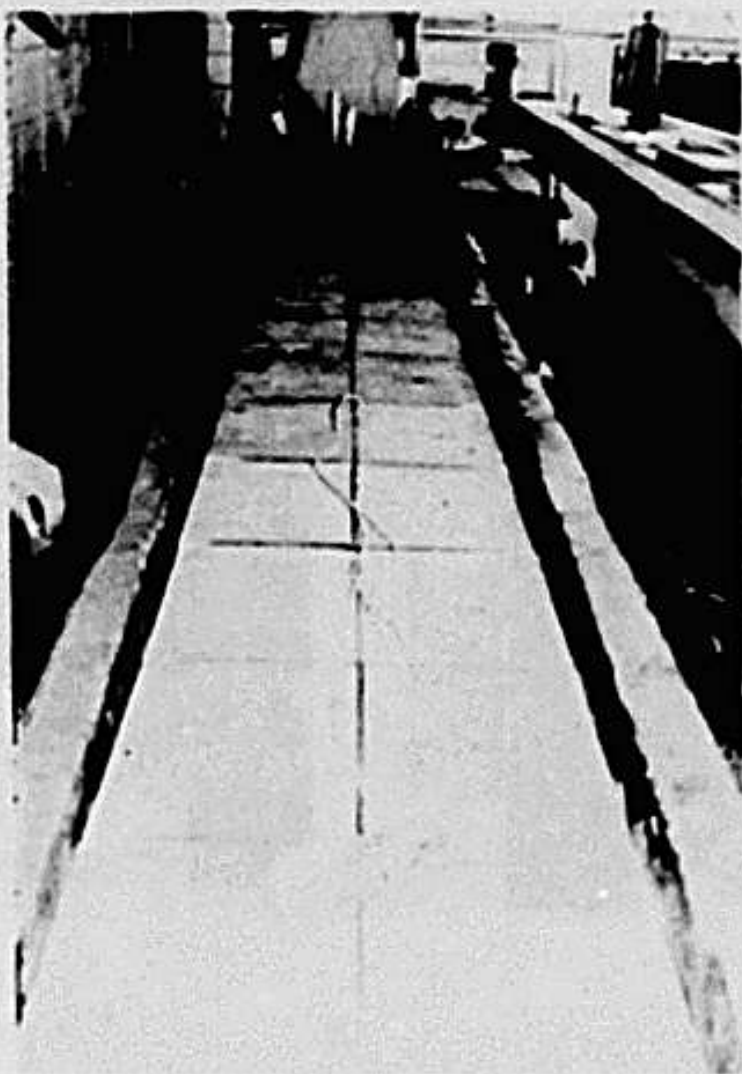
TEST SPECIMENS IN PLACE IN FIRE TEST TUNNEL
